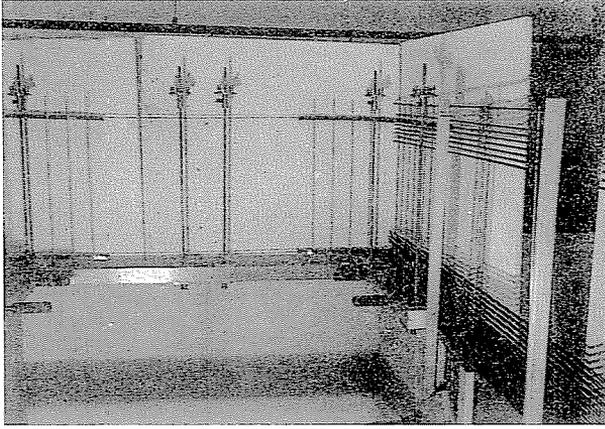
Beam and wall reinforcement.* The reinforcement of the beam protrudes into the "wings" of the U-shaped wall-pillar to constitute a continuous reinforcement — a "ring" — led round the corner by the reinforcing strips of the wall. The auxiliary positioning tool gets now into top position. It rests on four "tongues" which can be driven out and withdrawn by turning around the handles. After assembly of surface elements, the two beams and the two U-walls finally create a ring to be concreted as a single unit.
